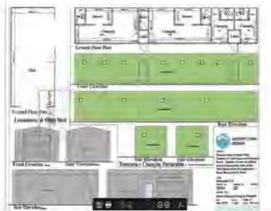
Equipment Store and Portacabin floorplans and Elevations
